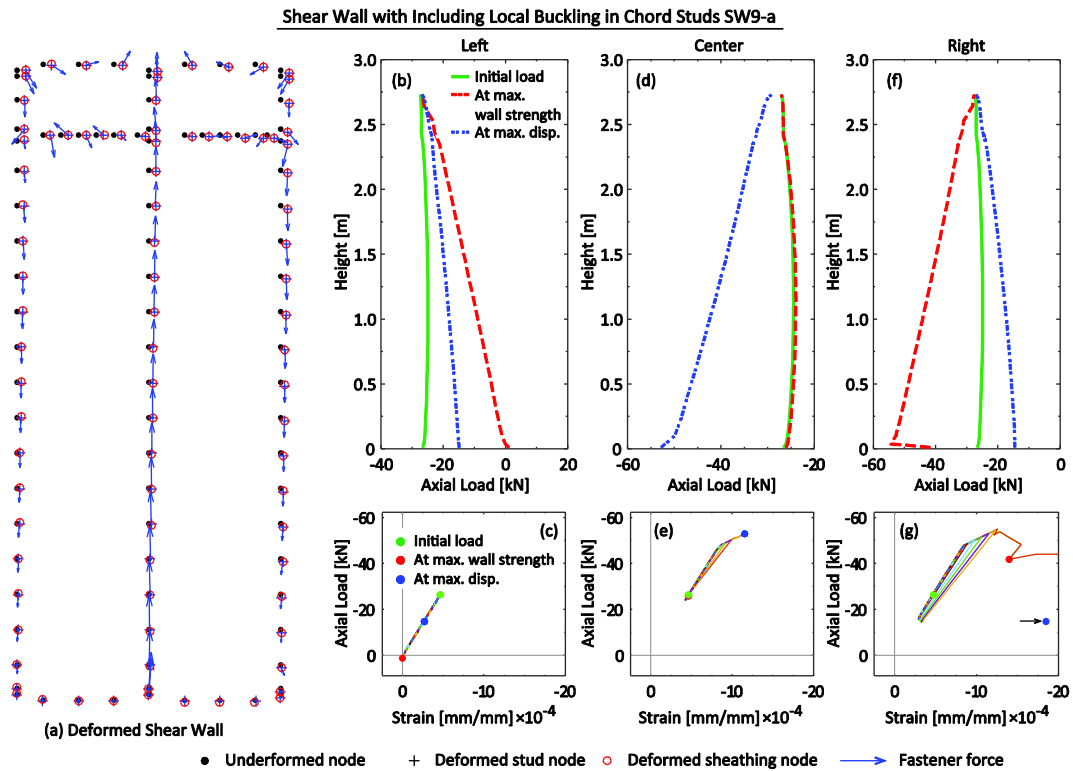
Shear wall (SW9-a) deformed shape (a) showing the wall failure mechanism triggered by local buckling of the compression chord stud followed by buckling in the infill stud.
